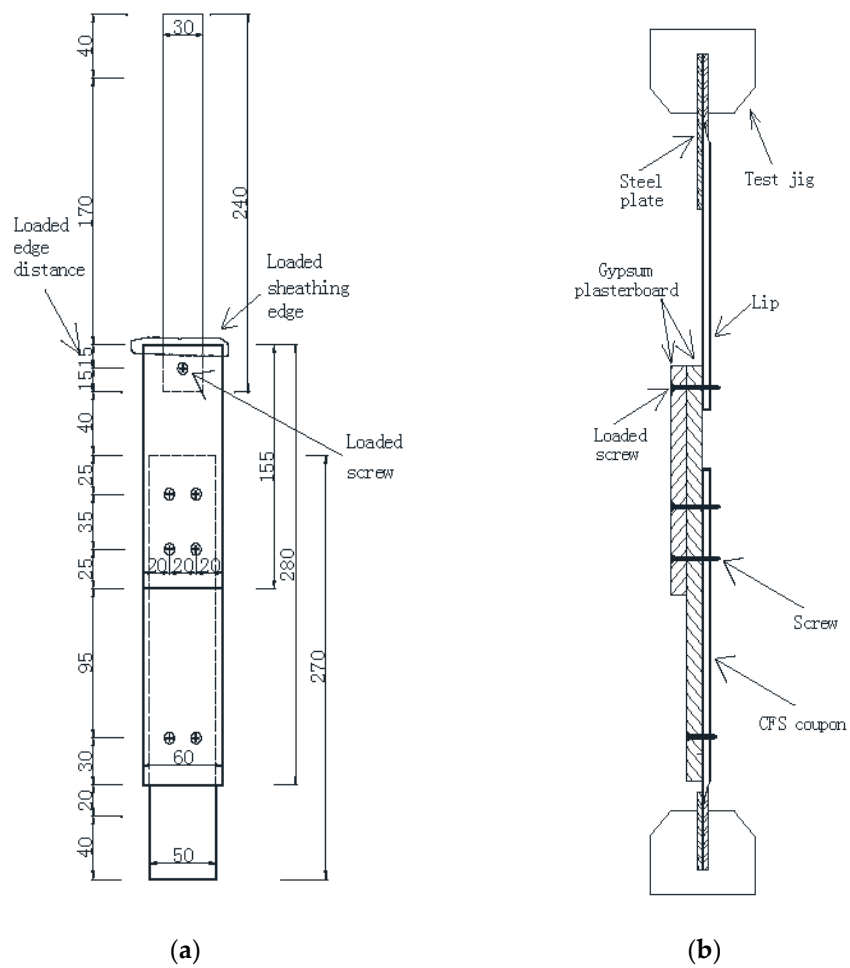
Connection details with double-layer sheathing and a loaded edge distance of 15 mm: (a) front view; and (b) side view.
